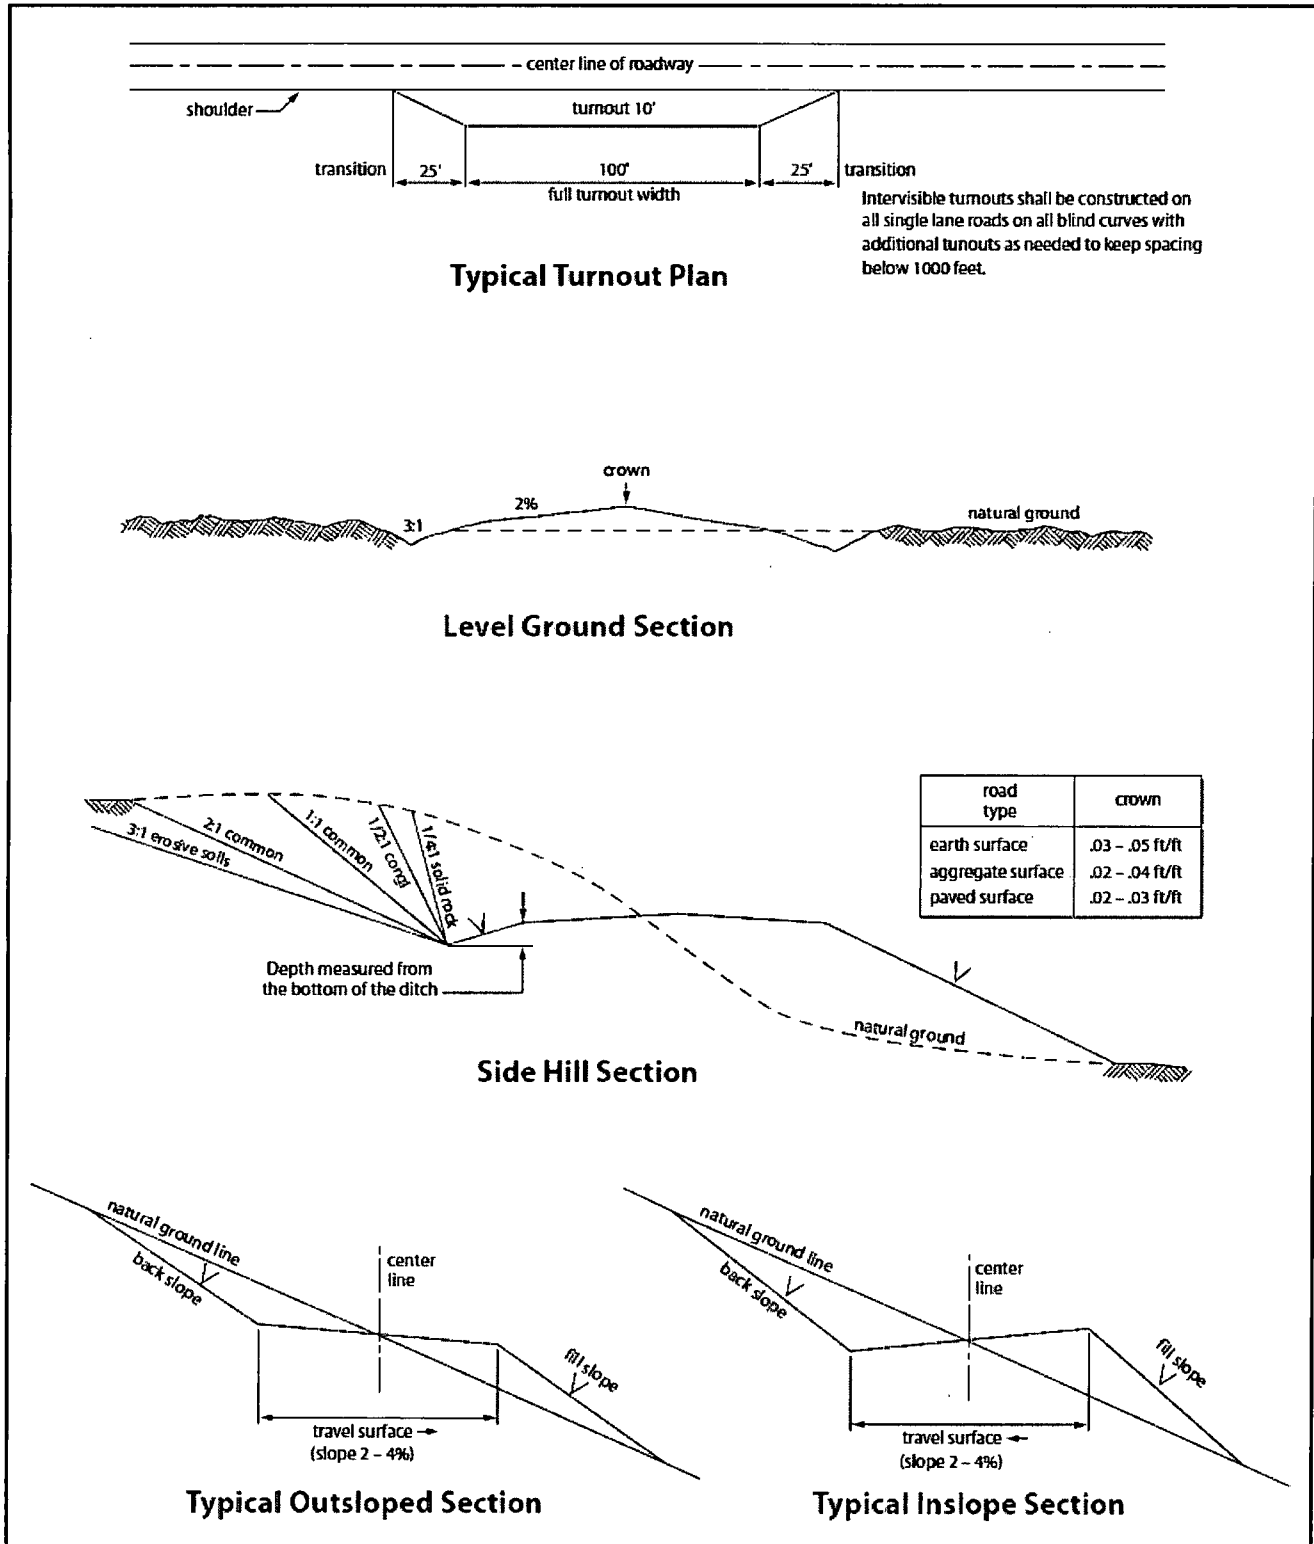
Cross-sections and plans for typical road sections representative of BLM resource or FS local and higher-class roads.
